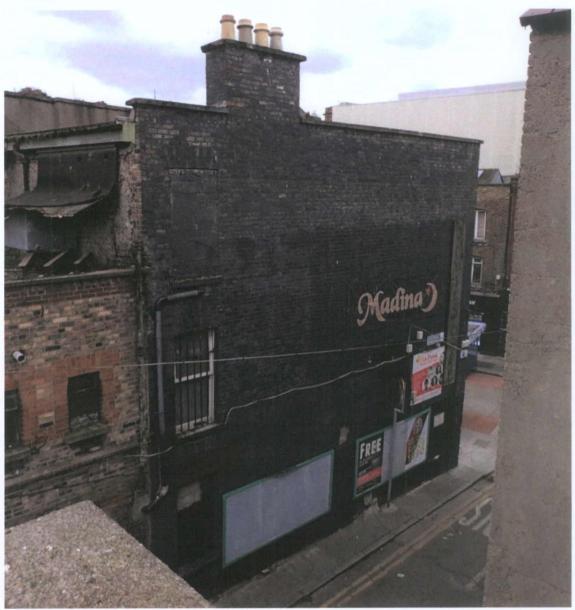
View of the painted north wall of No.9 Moore Street.
